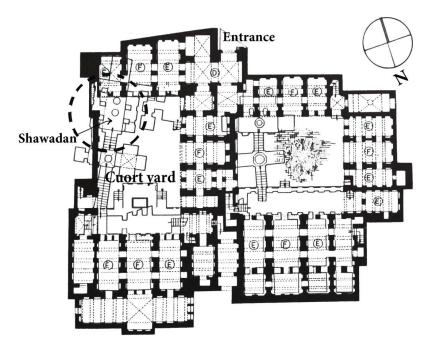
The Ground floor plan of TIZNO house in Dezful
